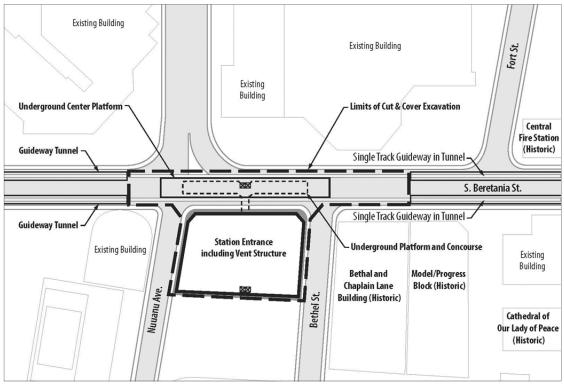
Beretania Street Tunnel Alternative Fort Street Station
